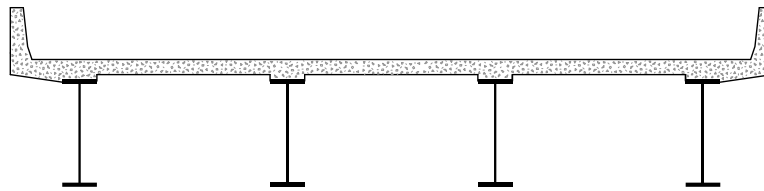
Typical composite rolled I-beam or welded I-girder bridge cross section.
